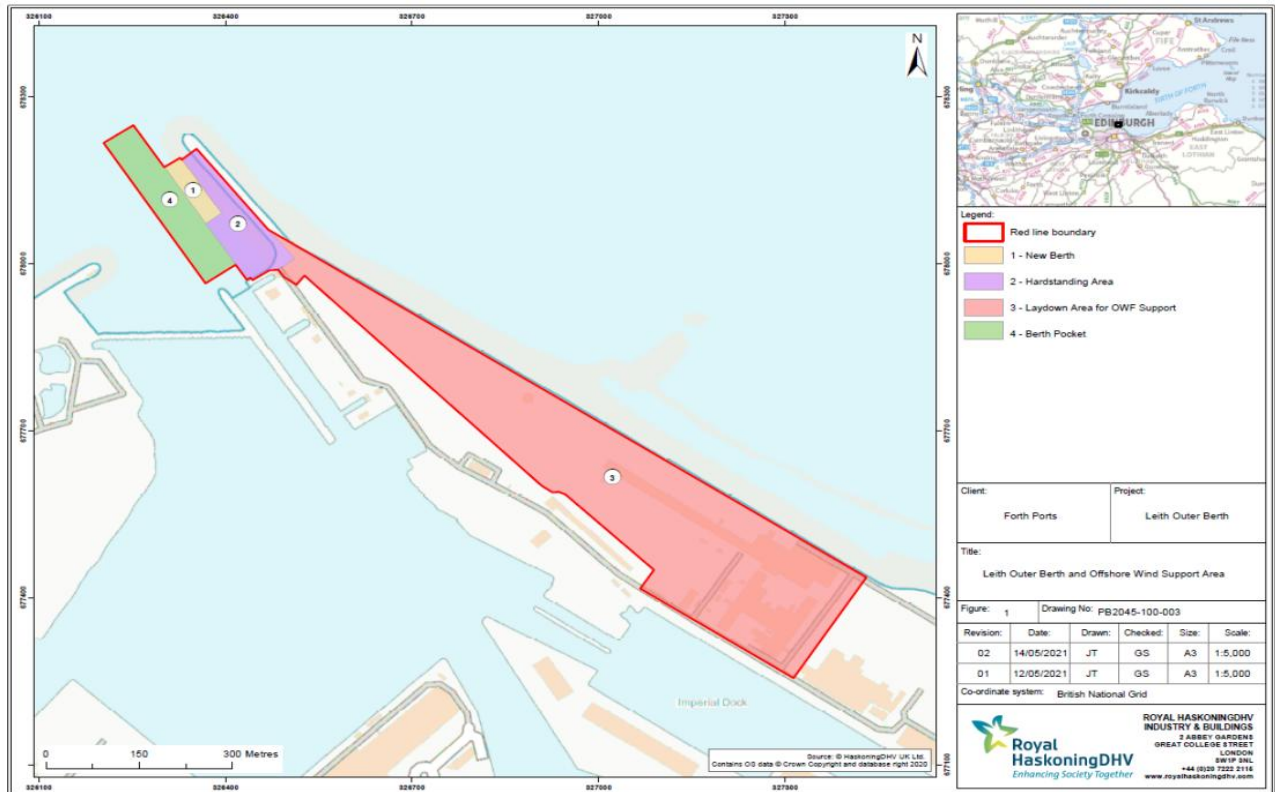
Showing the extent of the Proposed Works and the areas of each element of construction.
